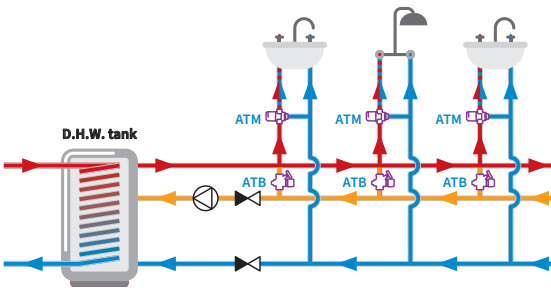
ATB valves used in a vertical circulation system with ATM thermostatic valves
